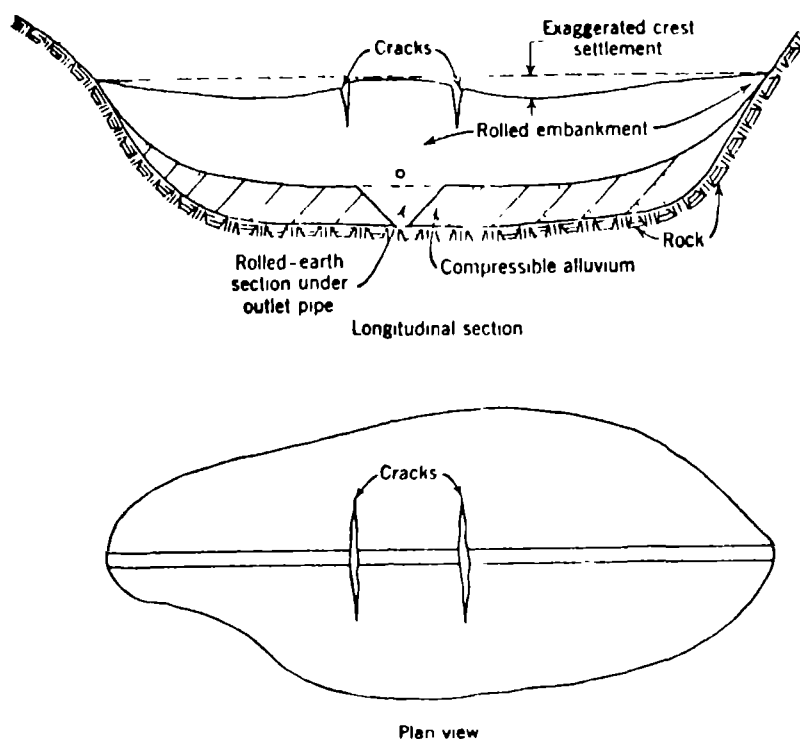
Cracking due to differential settlement between natural foundation soil and rolled-earth support under outlet pipe (or other discontinuity in the foundation).
